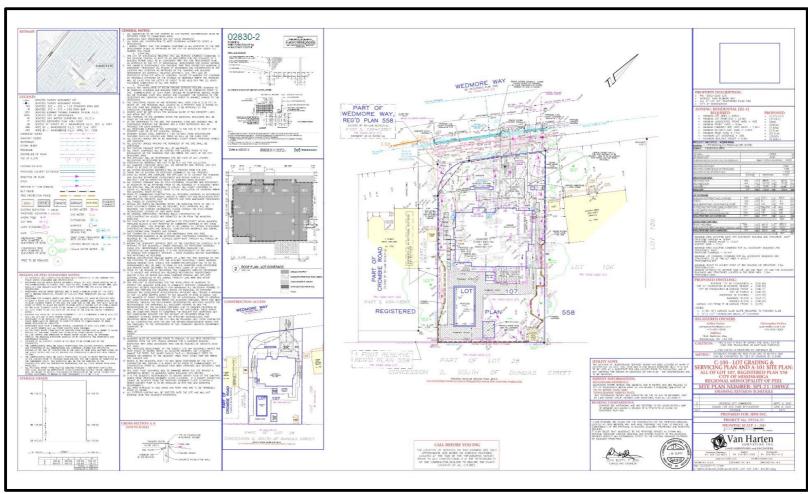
Proposed Development – Lot Grading and Servicing Plan (H4H Inc. 2021)
